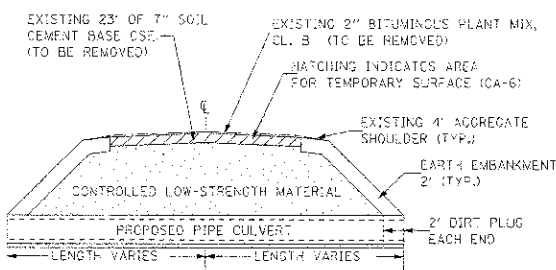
DETAIL OF ACROSS ROAD CULVERT PIPES
